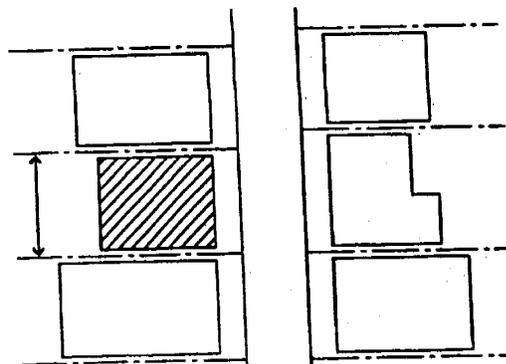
Maximizing the building's frontage helps to maintain a consistent street wall.
